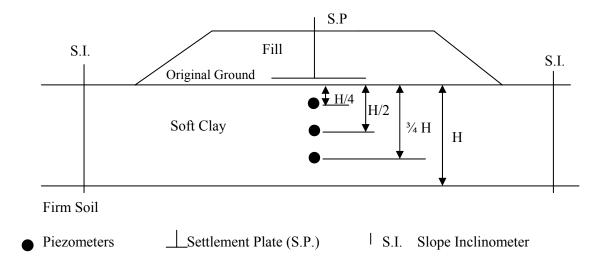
Typical locations for various types of monitoring instruments for an embankment constructed over soft ground.
